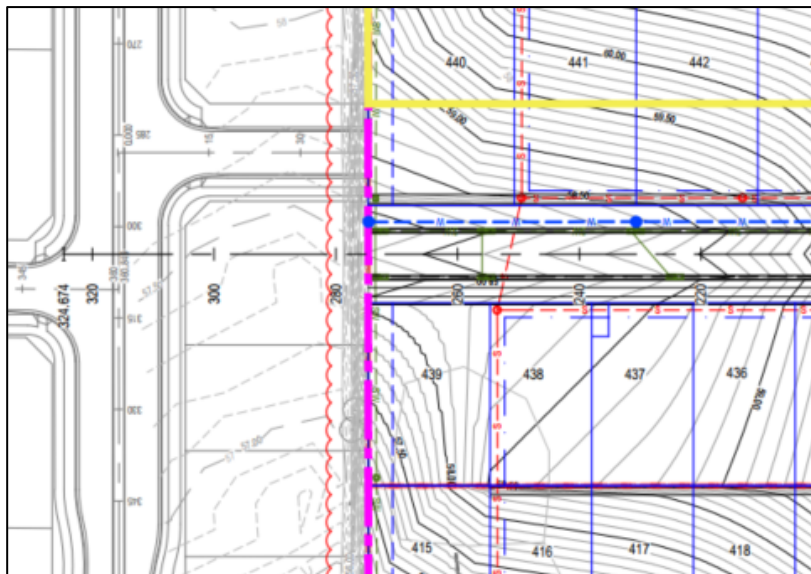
Proposed Plan under DS23/1169 (modification to SF10804) showing existing approved subdivision layout to the west of the site (Source: GHD, Dwg No. 23-16416-C111, Rev M, dated 28.10.2022)
